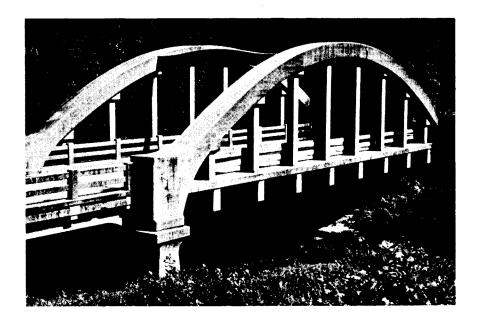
This concrete bowstring arch was built by the Virginia Department of Highways in 1926.
